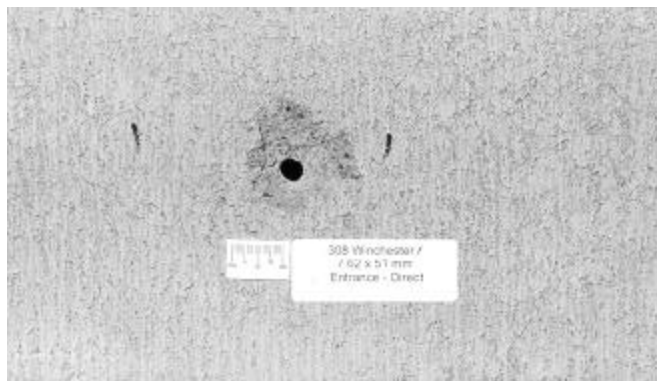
Damage to the 140 mm concrete block wall caused by .308 Winchester
